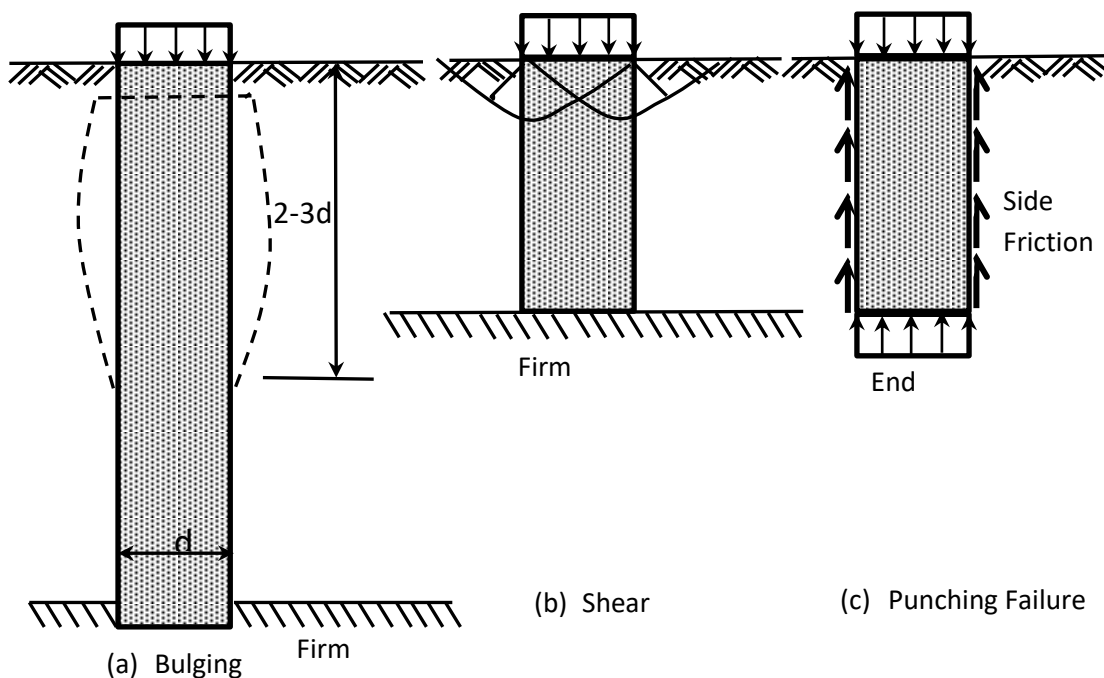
Modes of failure of stone columns (redrawn from Barksdale and Bachus, 1983)
